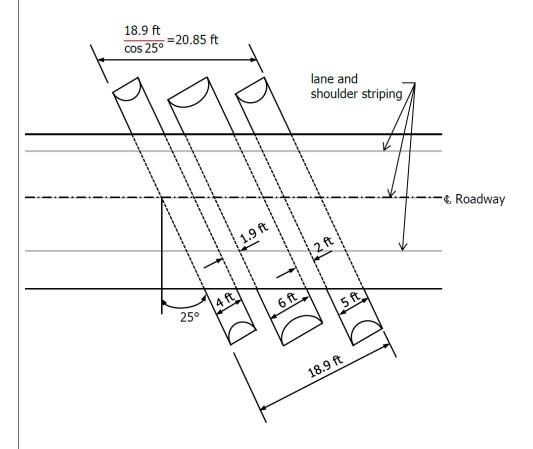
Plan view of a skewed, multi-pipe culvert under fill.
